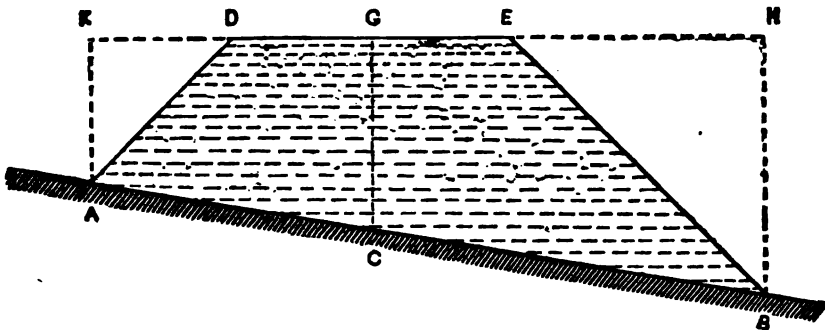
is a cross section of an embankment where the ground surface may or may not slope in the direction of the road, but has a sidelong slope.
